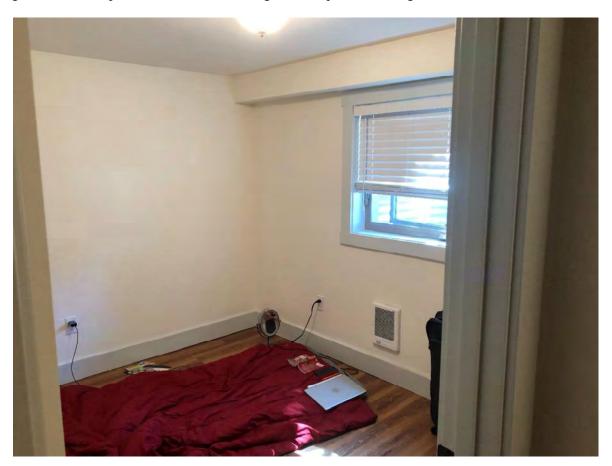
(After). Newton Apartments, Basement apartment, looking southeast. August 2020. Source: Stephen Day Architecture.
